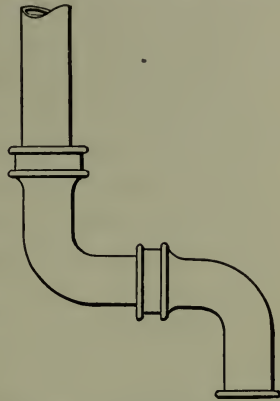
Improper bends in soil pipe. (Harrington.)
